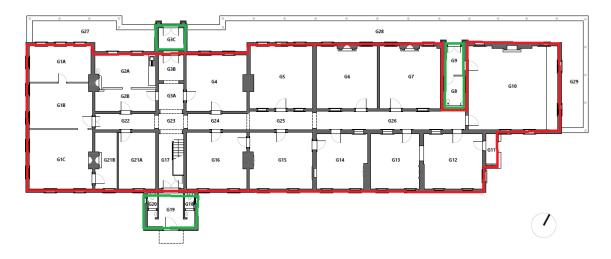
Architectural scope of works, with rooms to have subsurface reduction indicated in red and rooms with concrete floors and no impact in green. Source: Curio 2022 with markup
